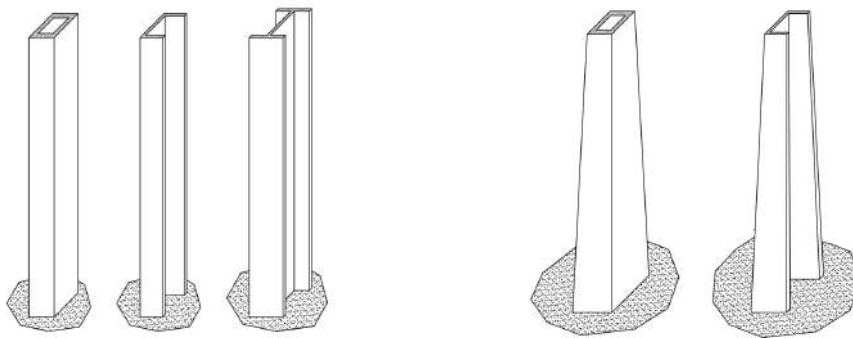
Horizontal stiffening in tall buildings: shear walls with constant section and tapering profiles.
